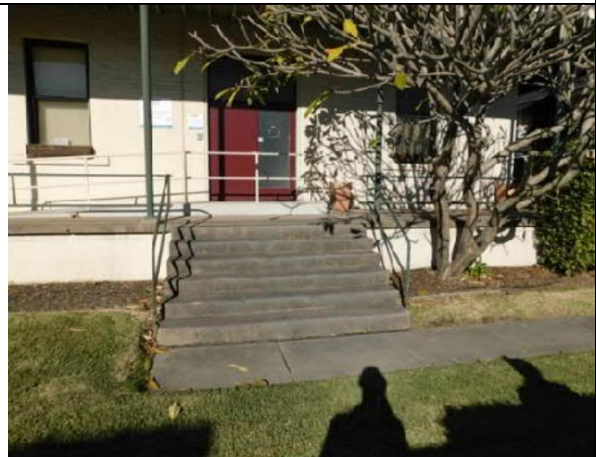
Entry steps and front door. Note the ground floor verandah has been replaced with concrete. Posts and balustrade are galvanised pipe. (Source: EJE Heritage, Heritage Impact Statement, 2023).
